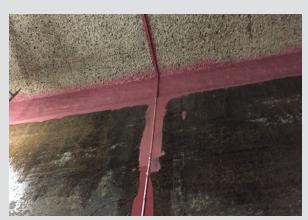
Temporary HDPE molds to rebuild Expansion Joint
